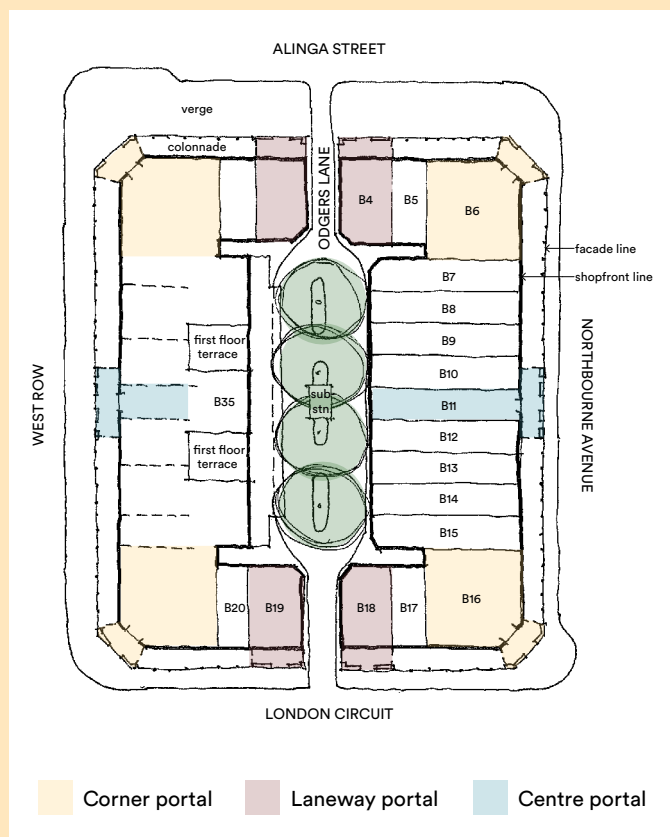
General layout plan of the Melbourne Building (CMP, p.29)
